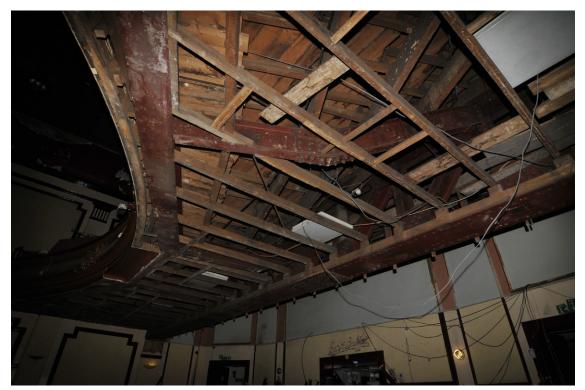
Underside of the first floor balcony with cladding removed exposing a Pratt truss spanning the width of the auditorium with bolted raker girders and original 19th century wooden form work
